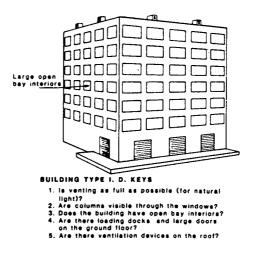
Framed Construction — Heavy Clad, Factory, Storage, or Parking Garage Variation.
